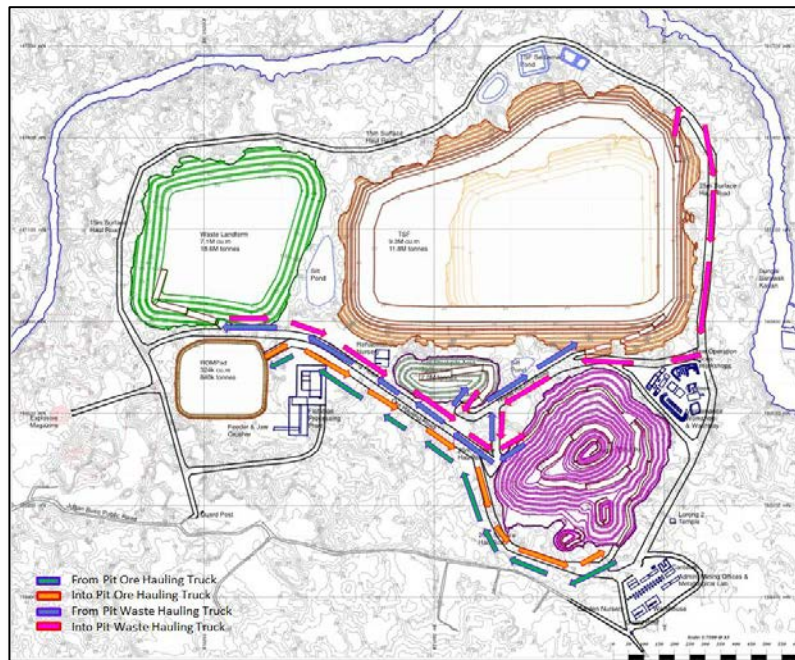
Jugan: Road and Ramp Configuration Alternate Option
